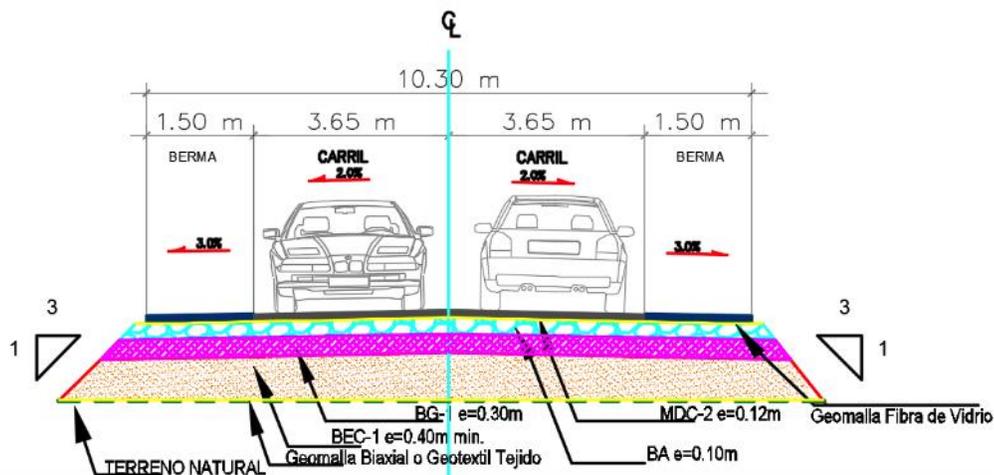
Typical section of road structure from Nueva Colonia to Puerto Bahía Colombia de Urabá.
